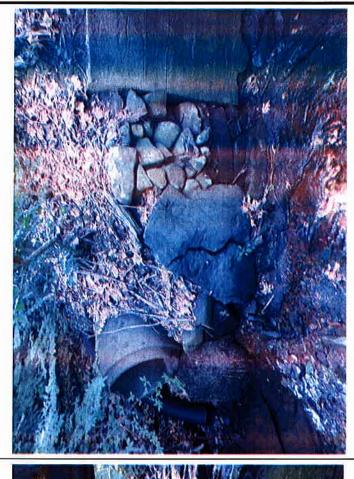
Abutment 2 elevation. Note voids/undermining at the bottom of the stem.
